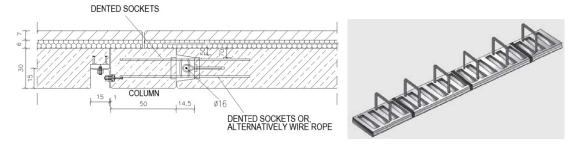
Connection between shear wall and columns using special casing rebend starters (right)
